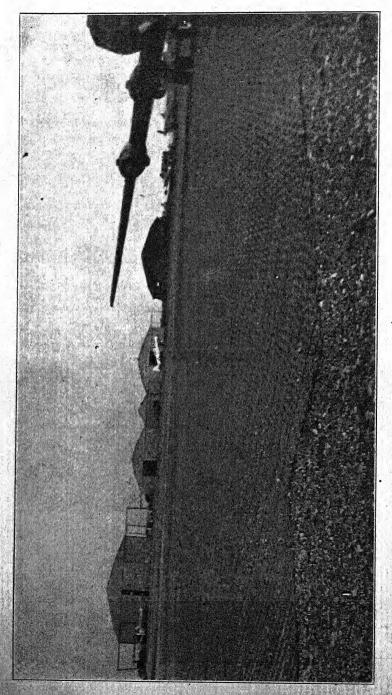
P.S.P. RUNWAY, WITH GRAVEL UNDERLAY UPON LOAMY SOIL, ALGERIA, 1943
